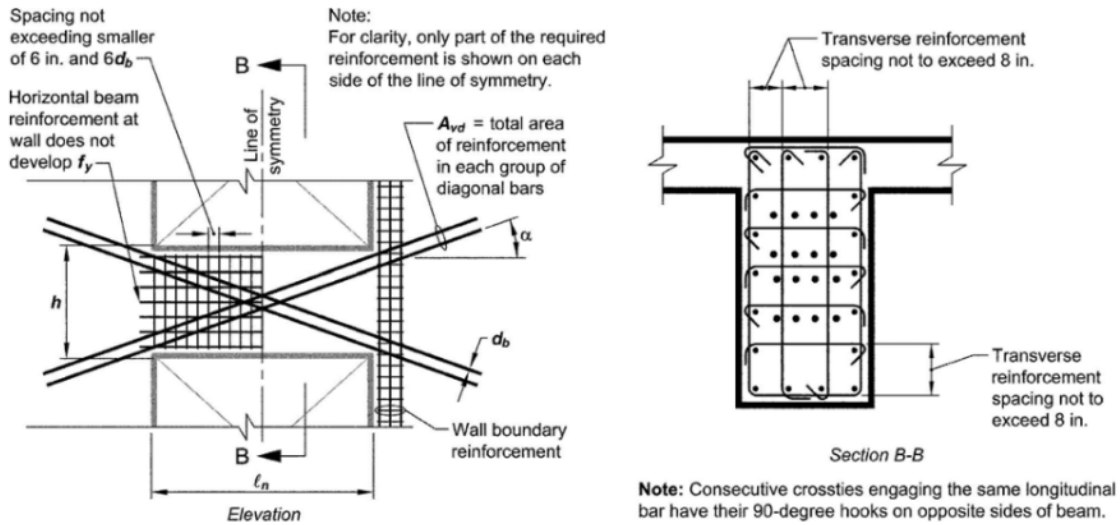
Alternate confinement reinforcement detailing for coupling beams in ACI 318-11 (ACI 318-11)
